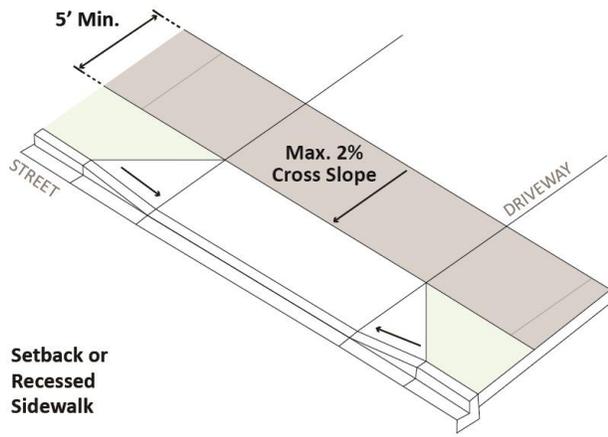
B. Sidewalk and Driveway Intersection Designs
